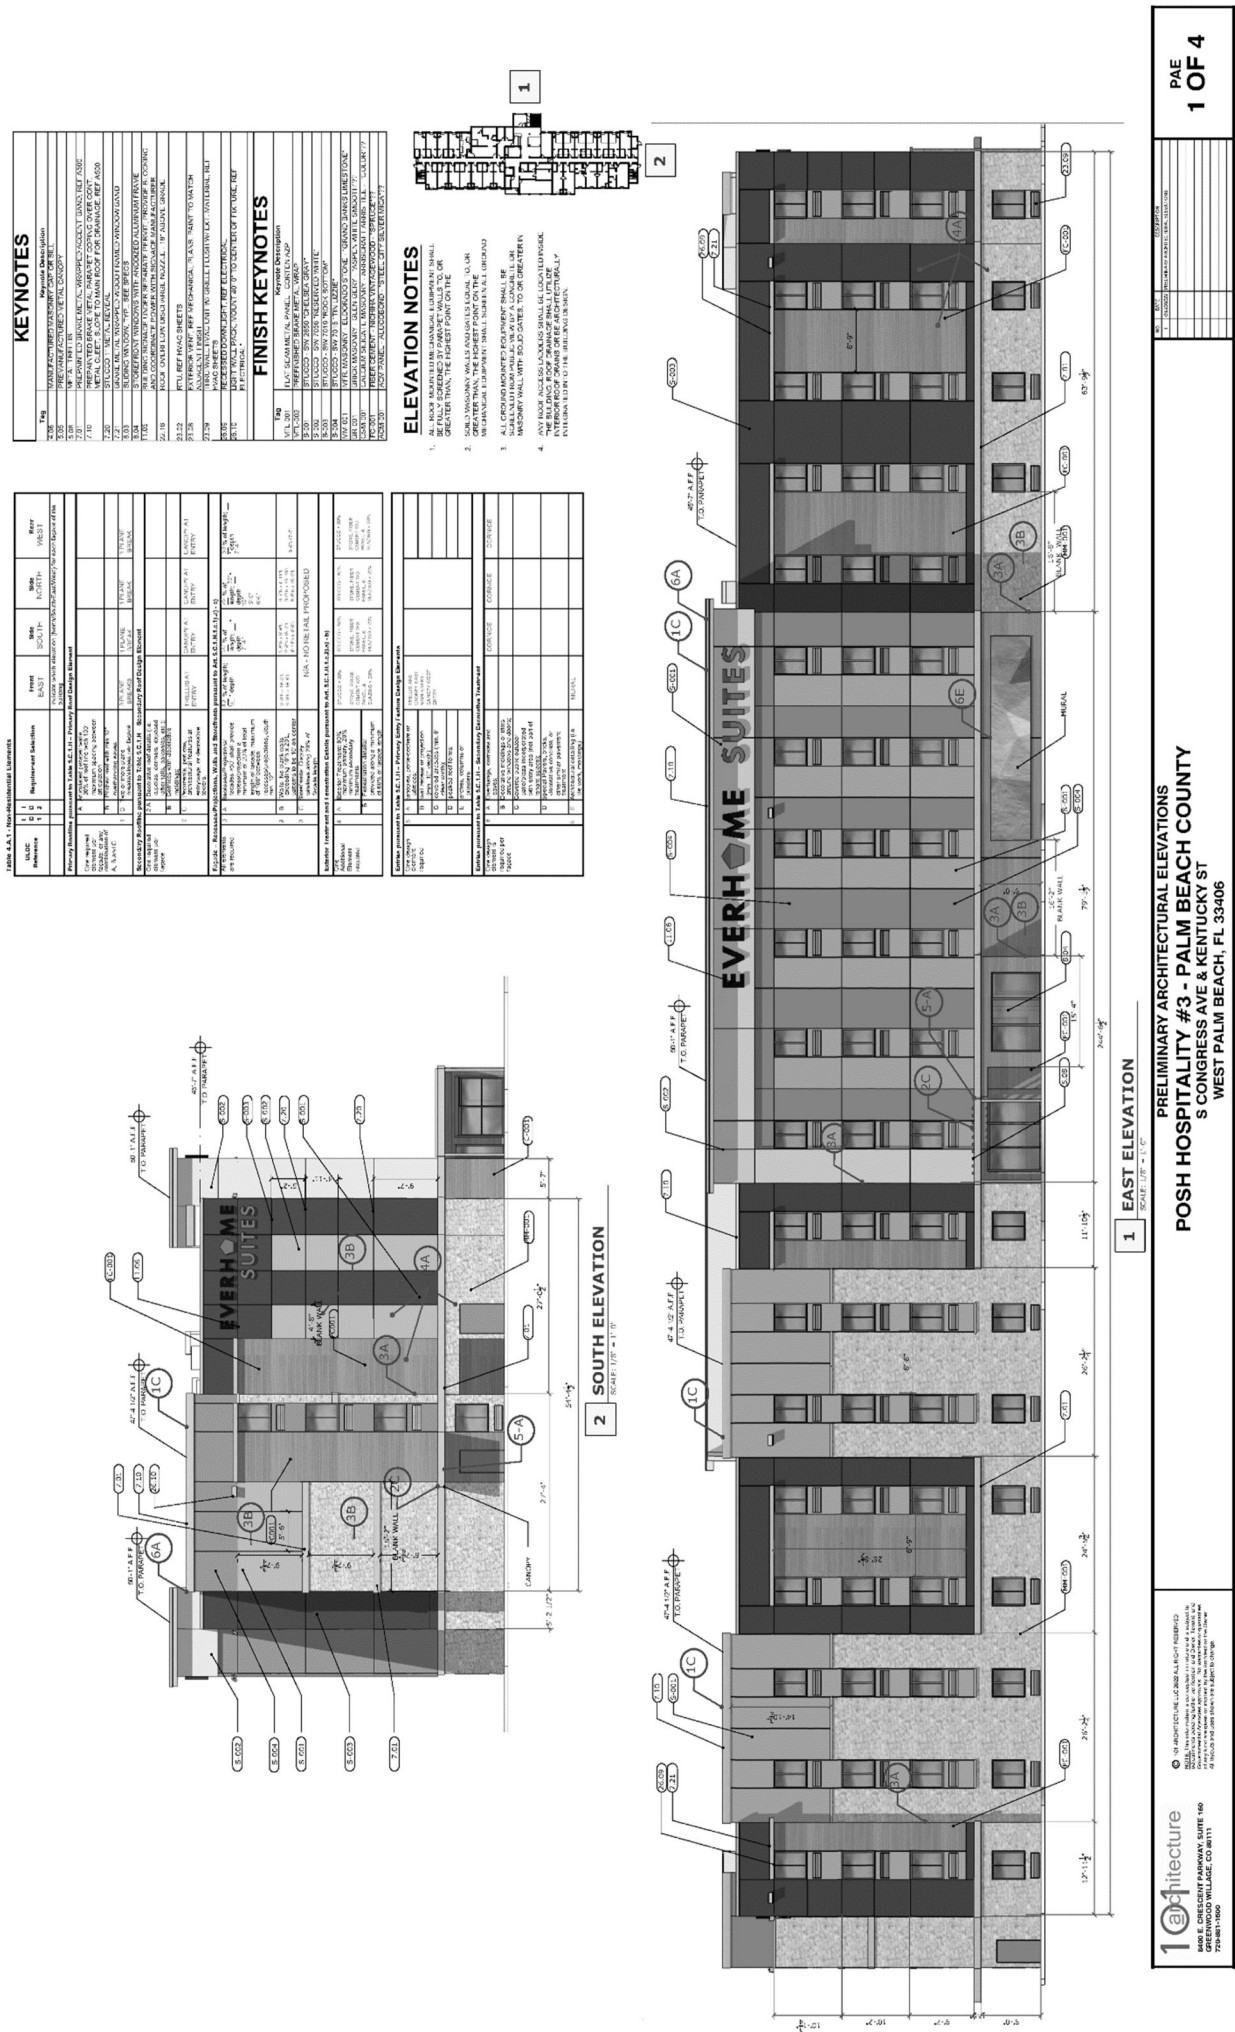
Preliminary Architectural Elevations dated May 22, 2023 (Page 1)
